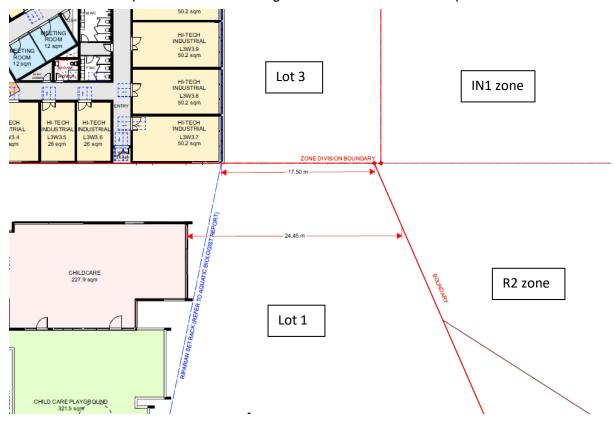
Level 3 Plan Extract (Source: Drawing No. DA\_106 - Bennett Murada Architects)
